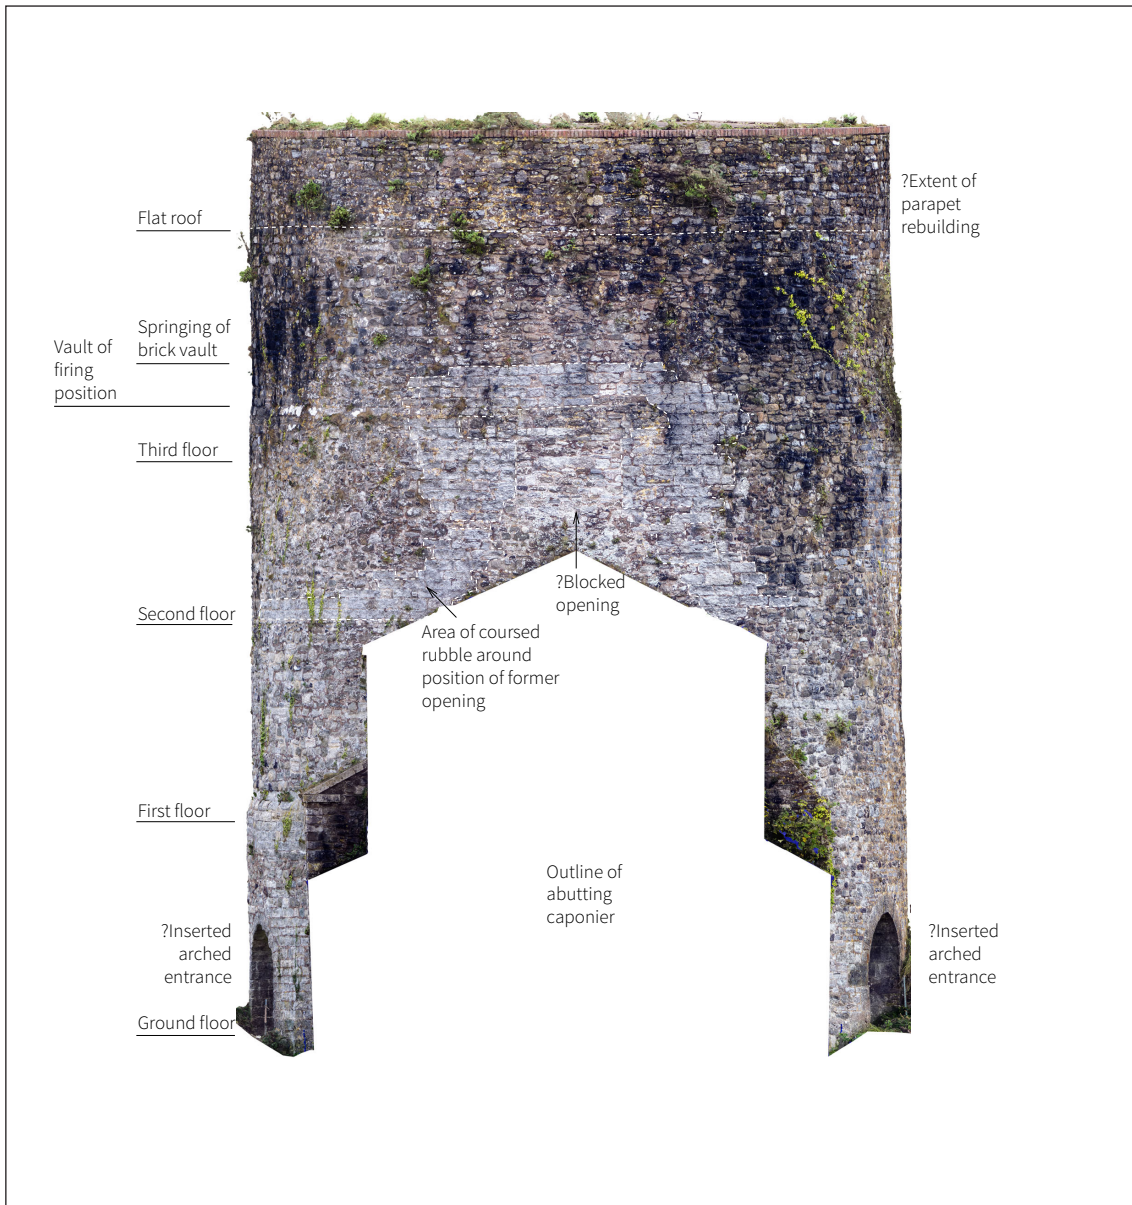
North elevation, St John's Tower (Photogrammetry courtesy of English Heritage)
